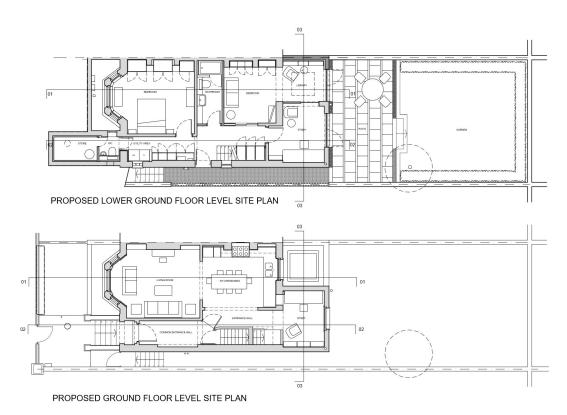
Proposed Ground and Lower Ground Floor Level Plans (refer to dwg PL_002)
